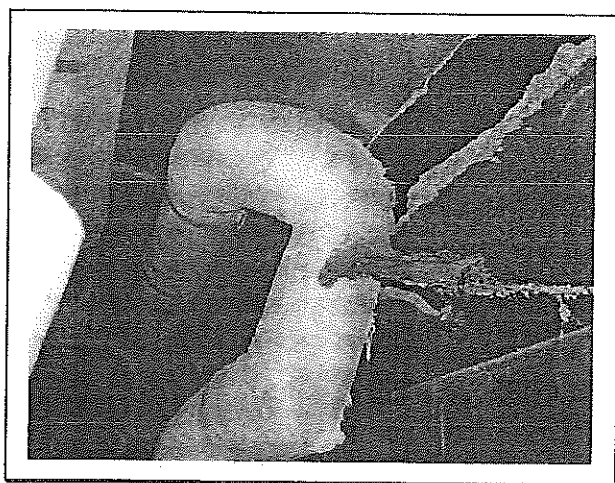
Viewing 10" pipe insulation, Basement near tunnel.
